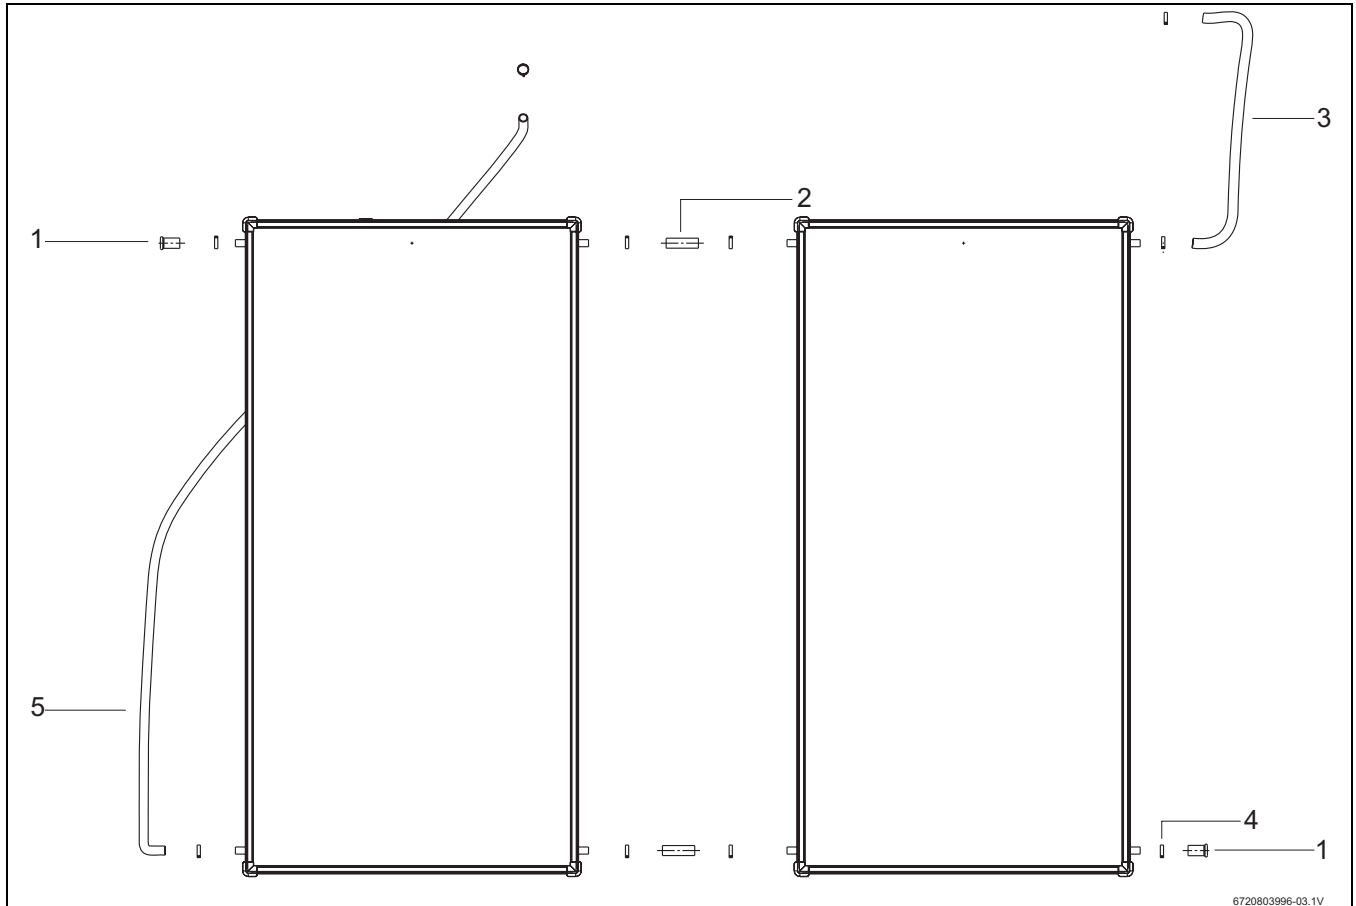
Installation sets for 2 collectors: 1 standard installation set, 1 extension installation set
